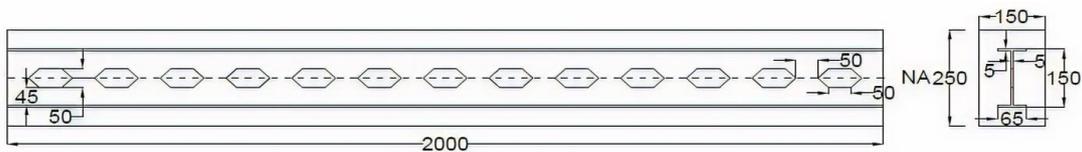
Concrete encased steel castellated beam opening at NA (CESB- H1)
